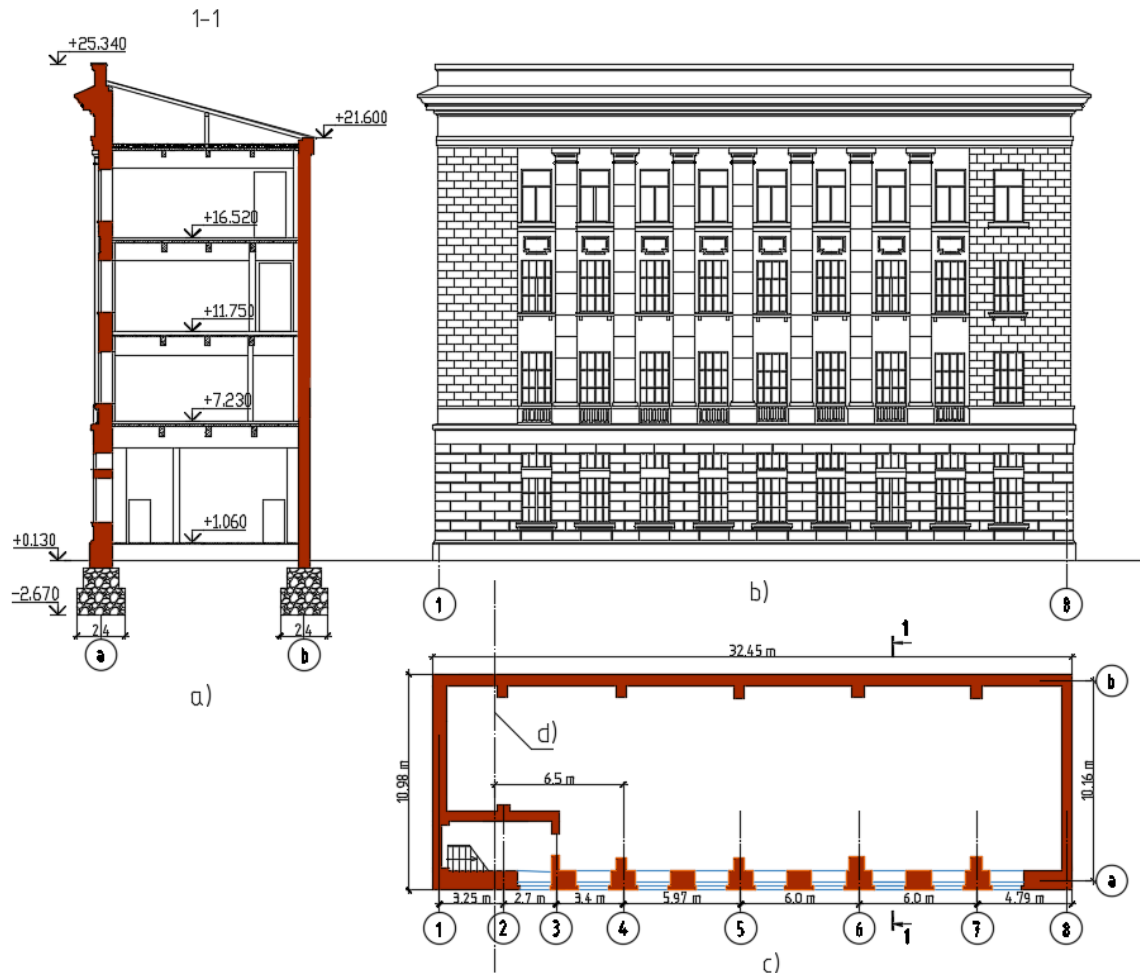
Administration building: cross plan 1-1 (a); face of the building (b); building plan (c); inclined tunnel centerline (d)
